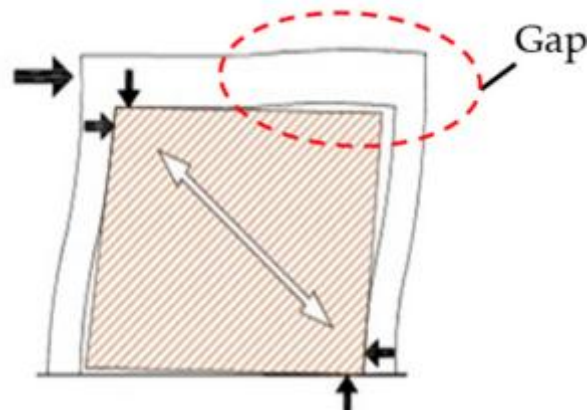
Behaviour of a masonry infill wall subjected to lateral loading
